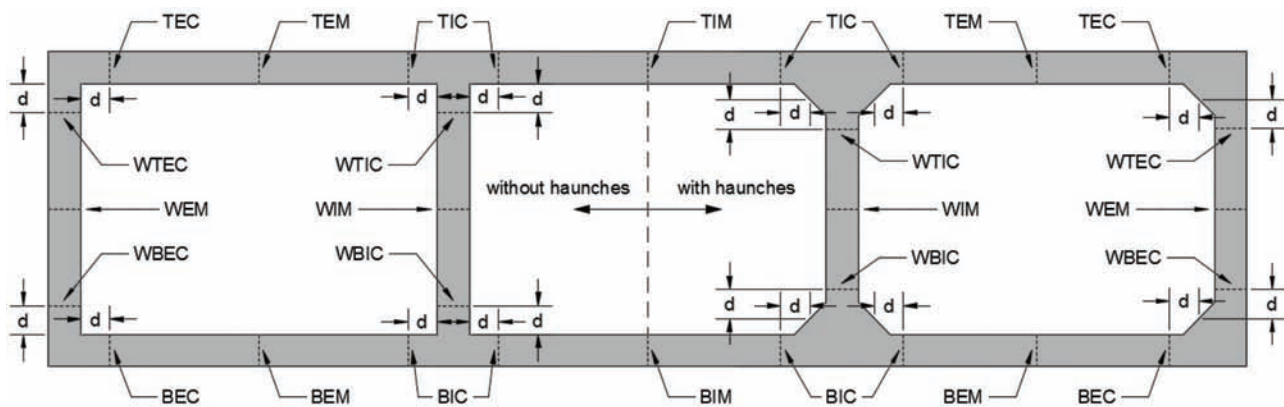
Shear critical sections for reinforced concrete box without haunches (left) and with haunches (right).
